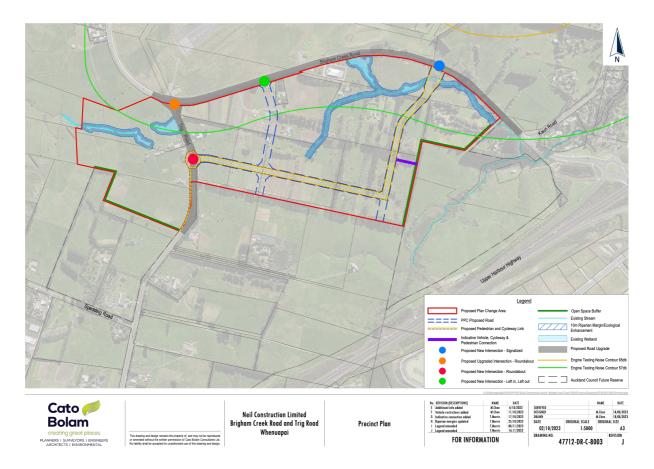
Proposed Precinct Plan (Source: Catobolam)
